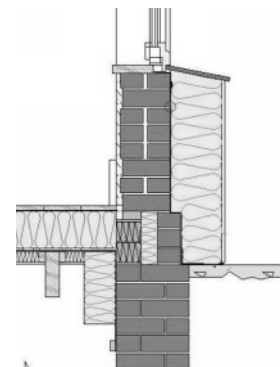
Wall to suspended floor as built. Wall U = 0.12, Floor U = 0.18
